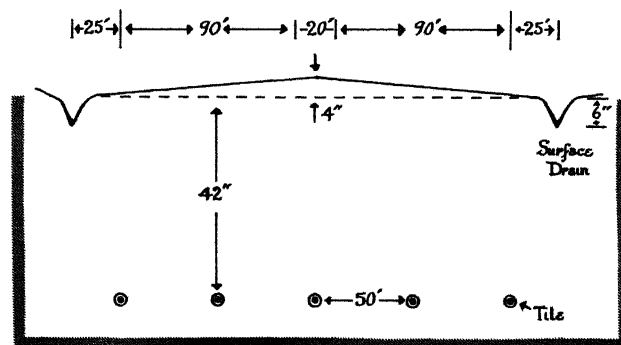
Cross section of tile drained range after installing positive surface drainage. Non-tiled ranges have similar surface conformation.
